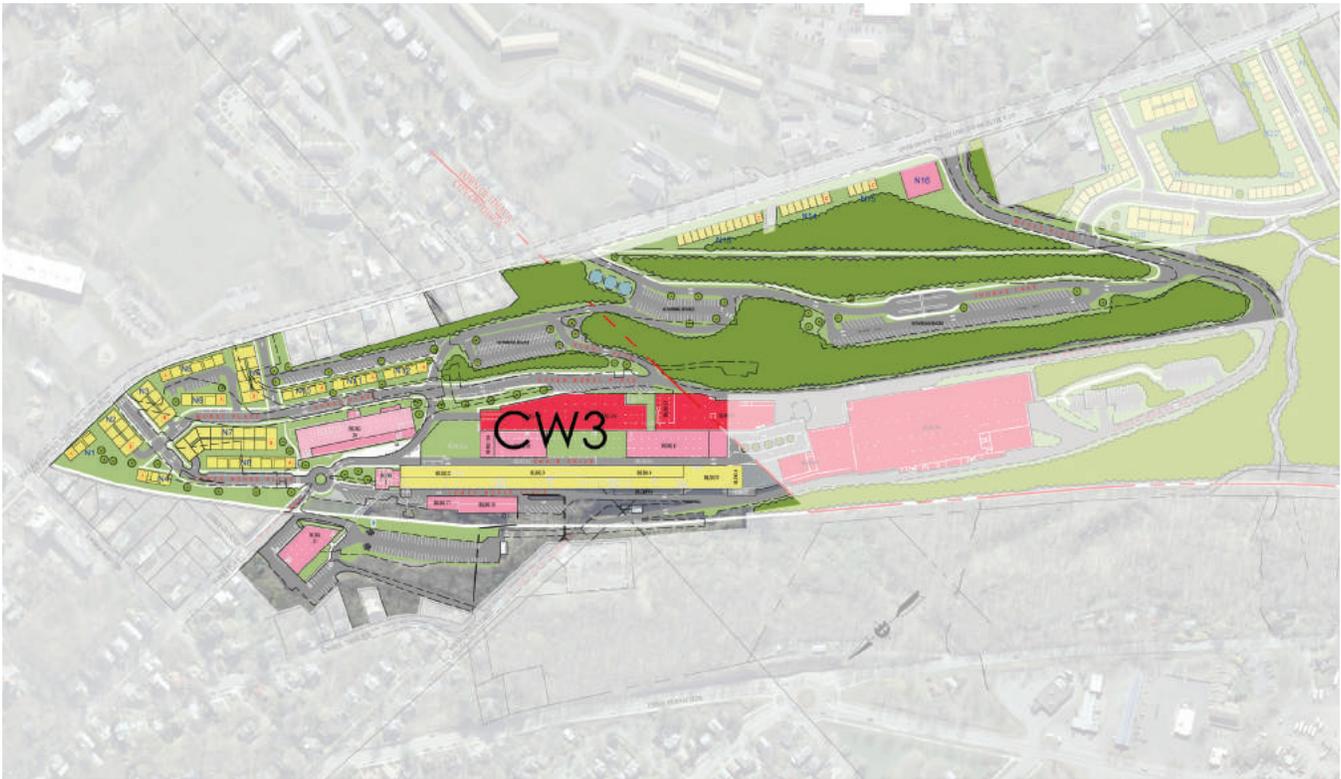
Conceptual Site Layout Plan - CW3 Sub Area (FE)
